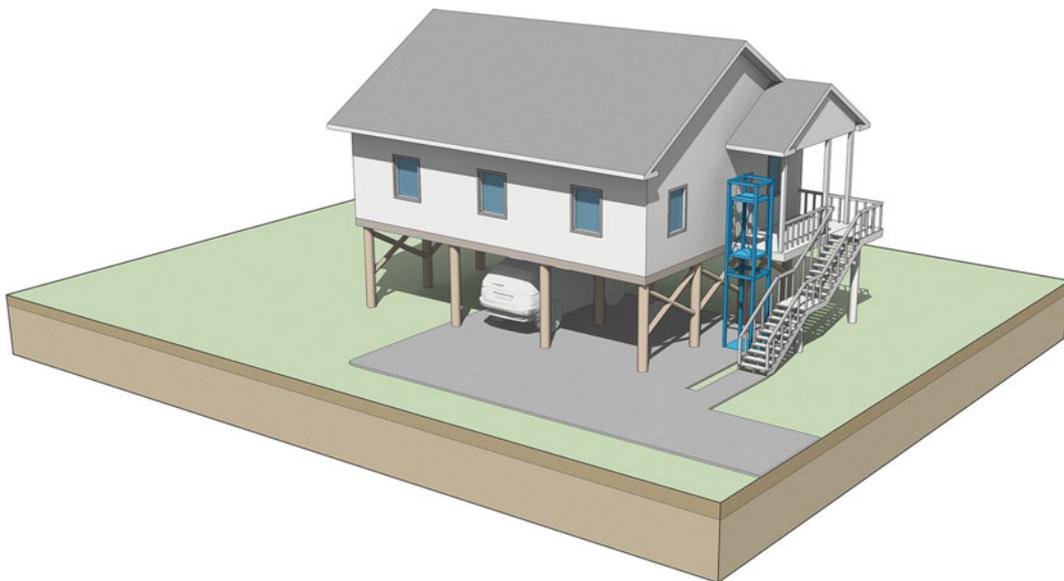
Diagram of an elevated structure on piles with an elevator (Credit: Giovanni Coakley, LSU School of Architecture)
